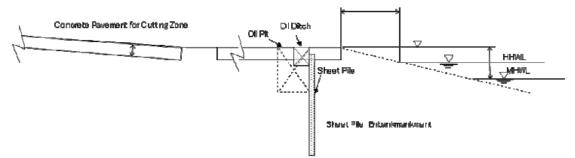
Plan of Improvement of Existing Ship Recycling Yard
